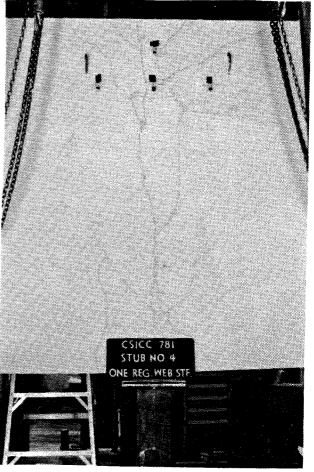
Cracking Pattern in Slab of Stub Specimen III
